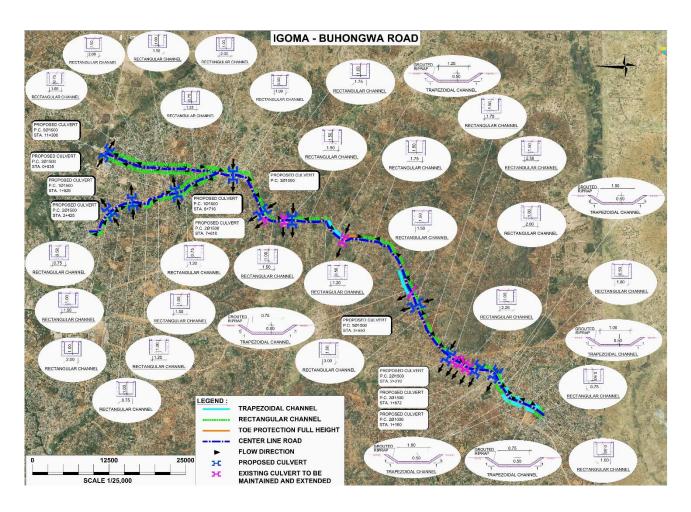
Proposed drainage system for Igoma-Buhongwa Road
